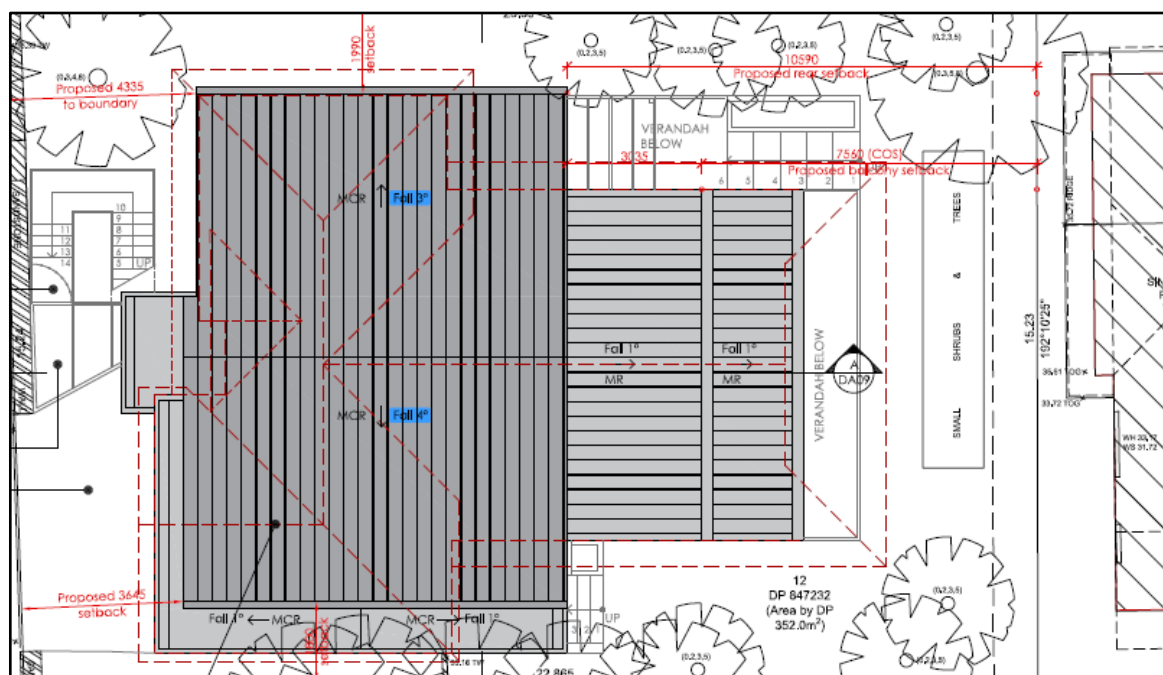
Approved site and roof plan (Source: Edifice Design 2021, DA/637/2019)
